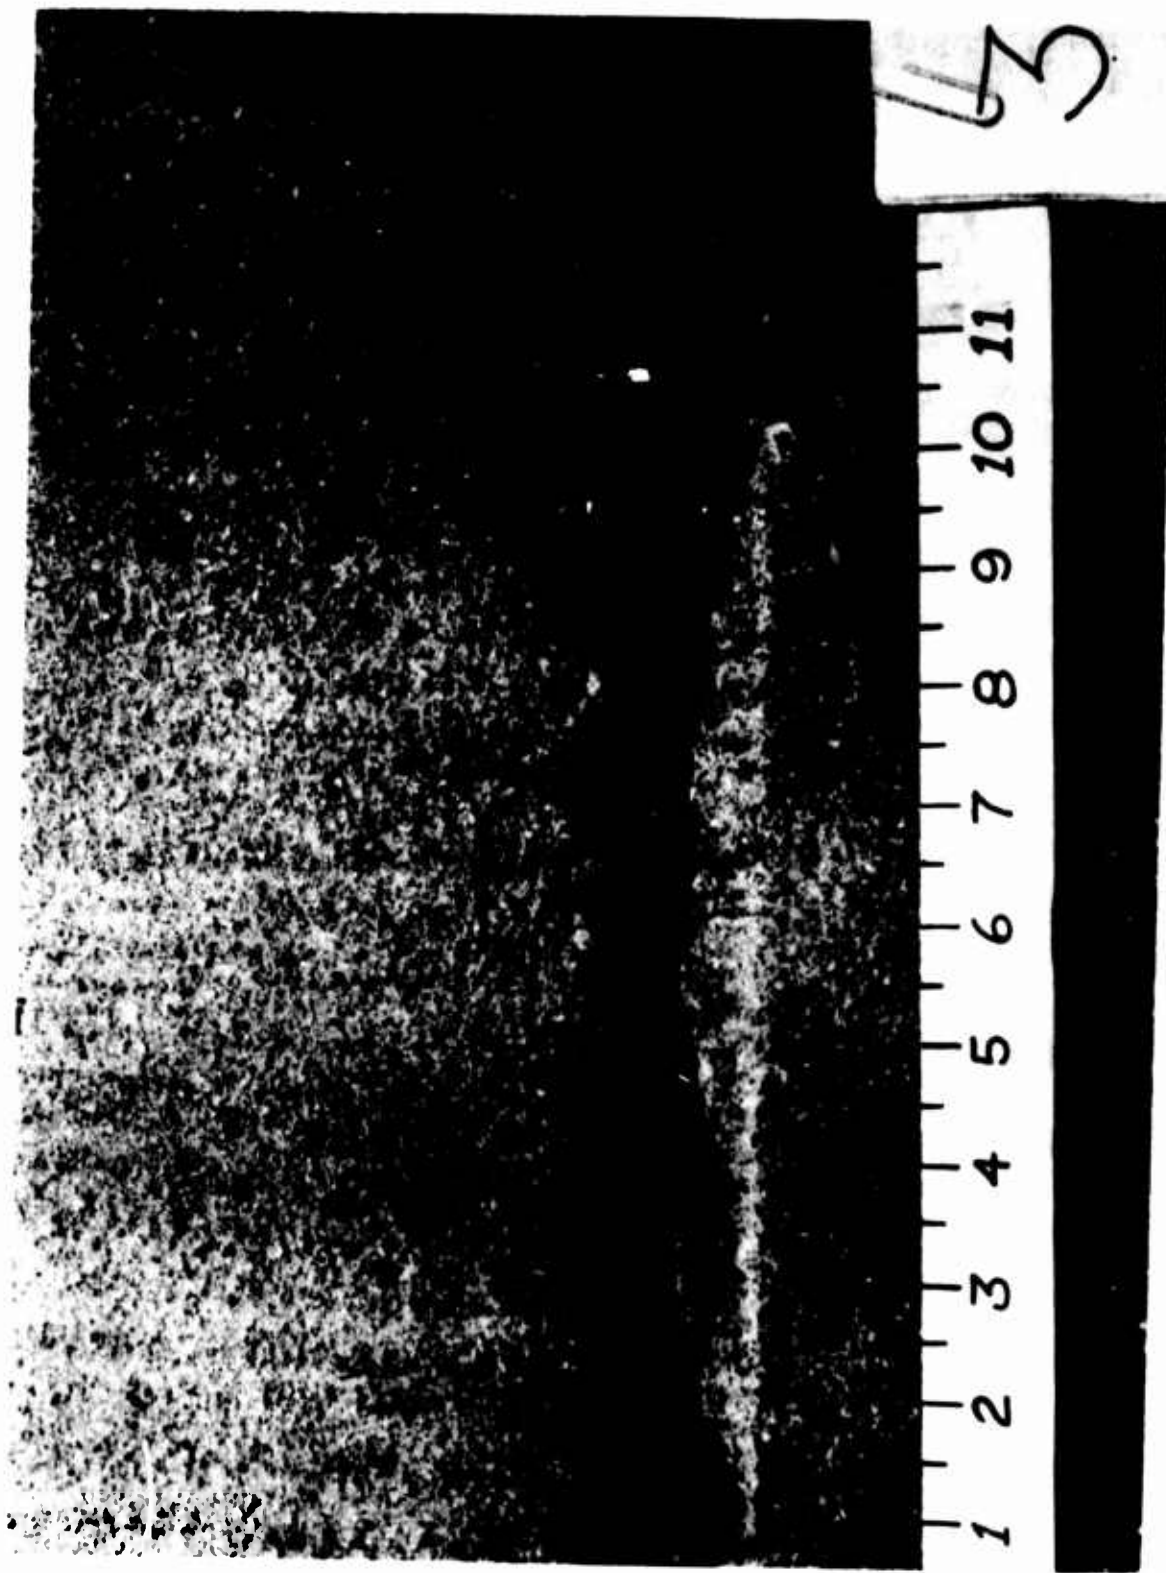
Typical minor transverse spalls, Runway 18-36,
